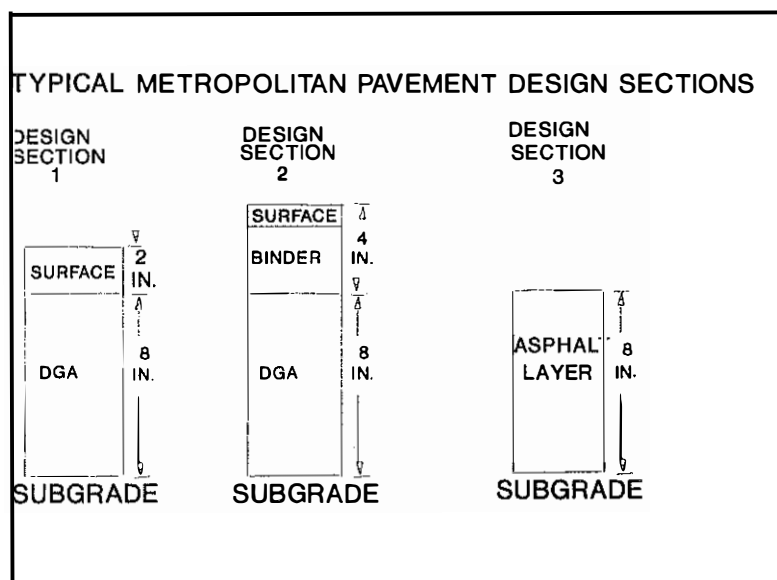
Typical Pavement Sections of Metropolitan City Streets for Low-Volume Traffic.
